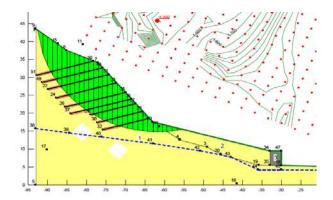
Proposed stabilization with soil nailing subsurface drainage and toe wall
